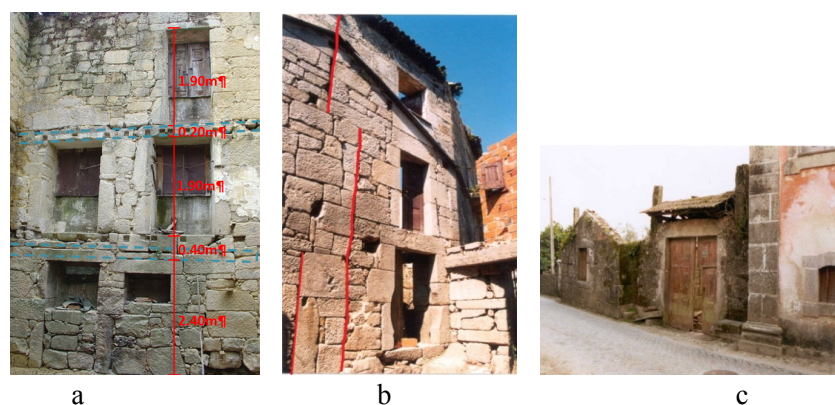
a) Building floors constraints; b) Lack of posterior façade without reinforcement and strengthened; c) Site works with limited access entrance.
